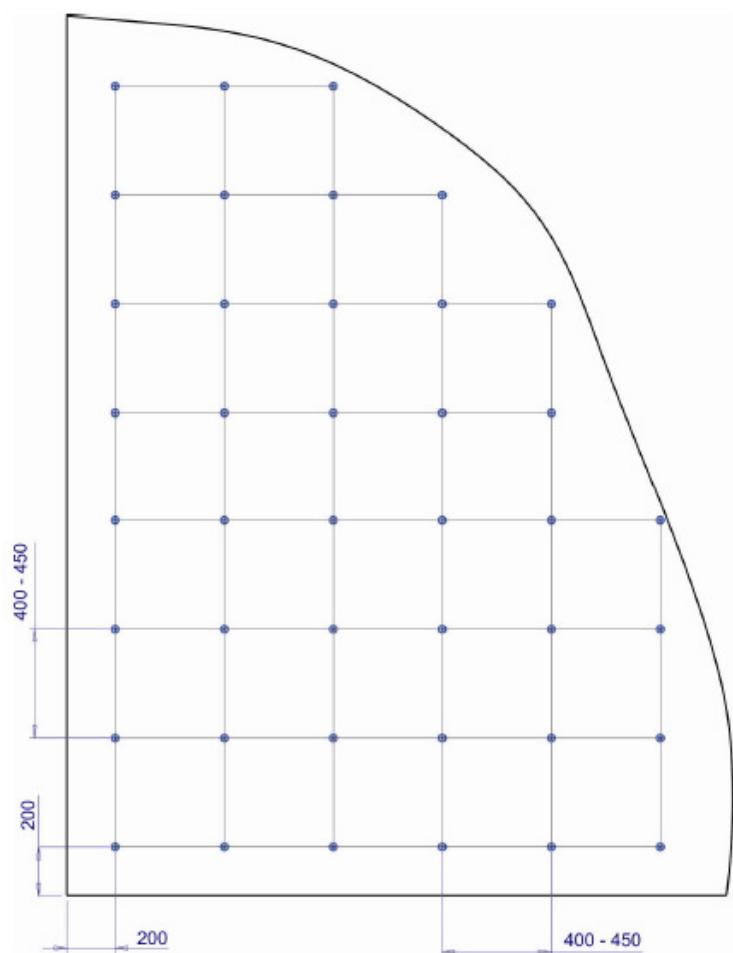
Arrangement scheme and edge distances of FRP tie anchors in a double wall with internal insulation or a sandwich wall.
